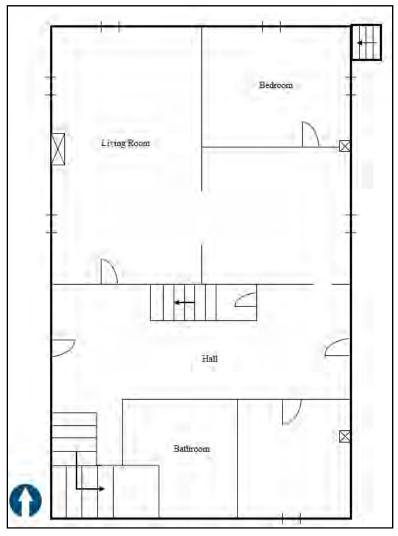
FIRST STORY PLAN (NOT TO SCALE)
